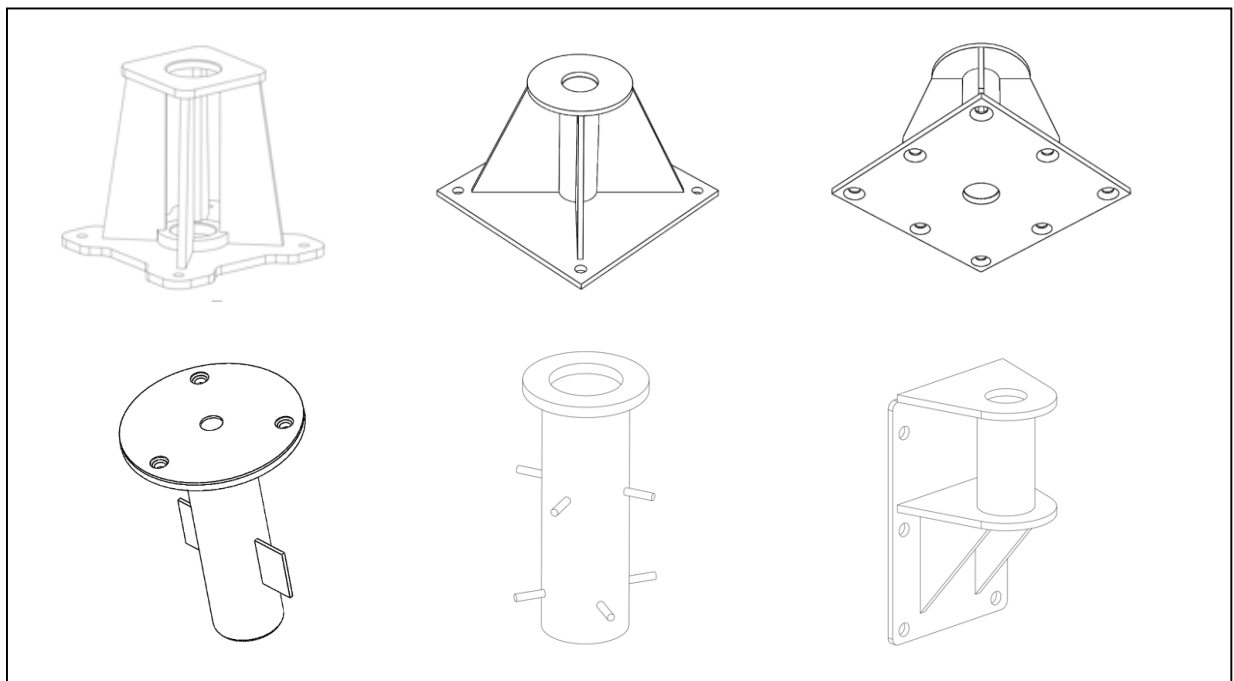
typical sockets, top surface mounted type sockets, bottom left and bottom middle cast in socket, bottom right side mounted.
